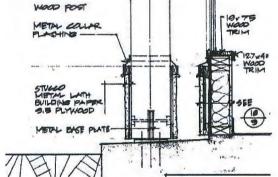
Typical base of exterior column (from Howard Yano Architects).
